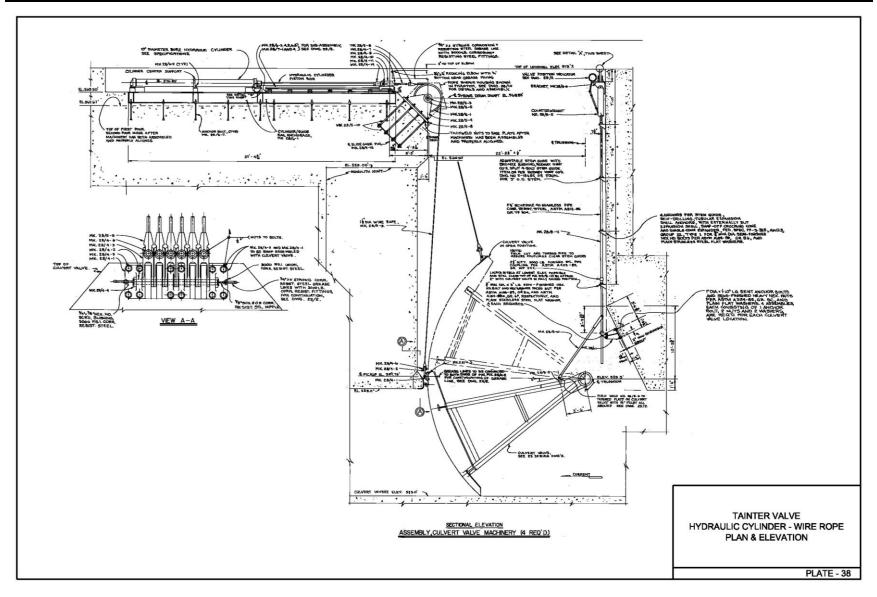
Plate 38: Tainter valve hydraulic cylinder-wire rope plan & elevation
